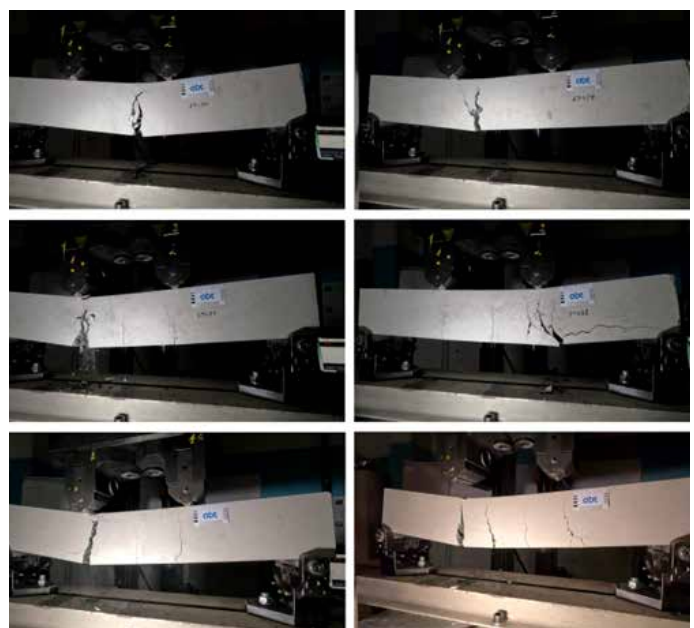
Beam tests with hybrid reinforcement just before collapse. Regular rebar with steel fibre (top), basalt reinforcement with steel fibre (middle) and basalt reinforcement with basalt fibre (bottom)
